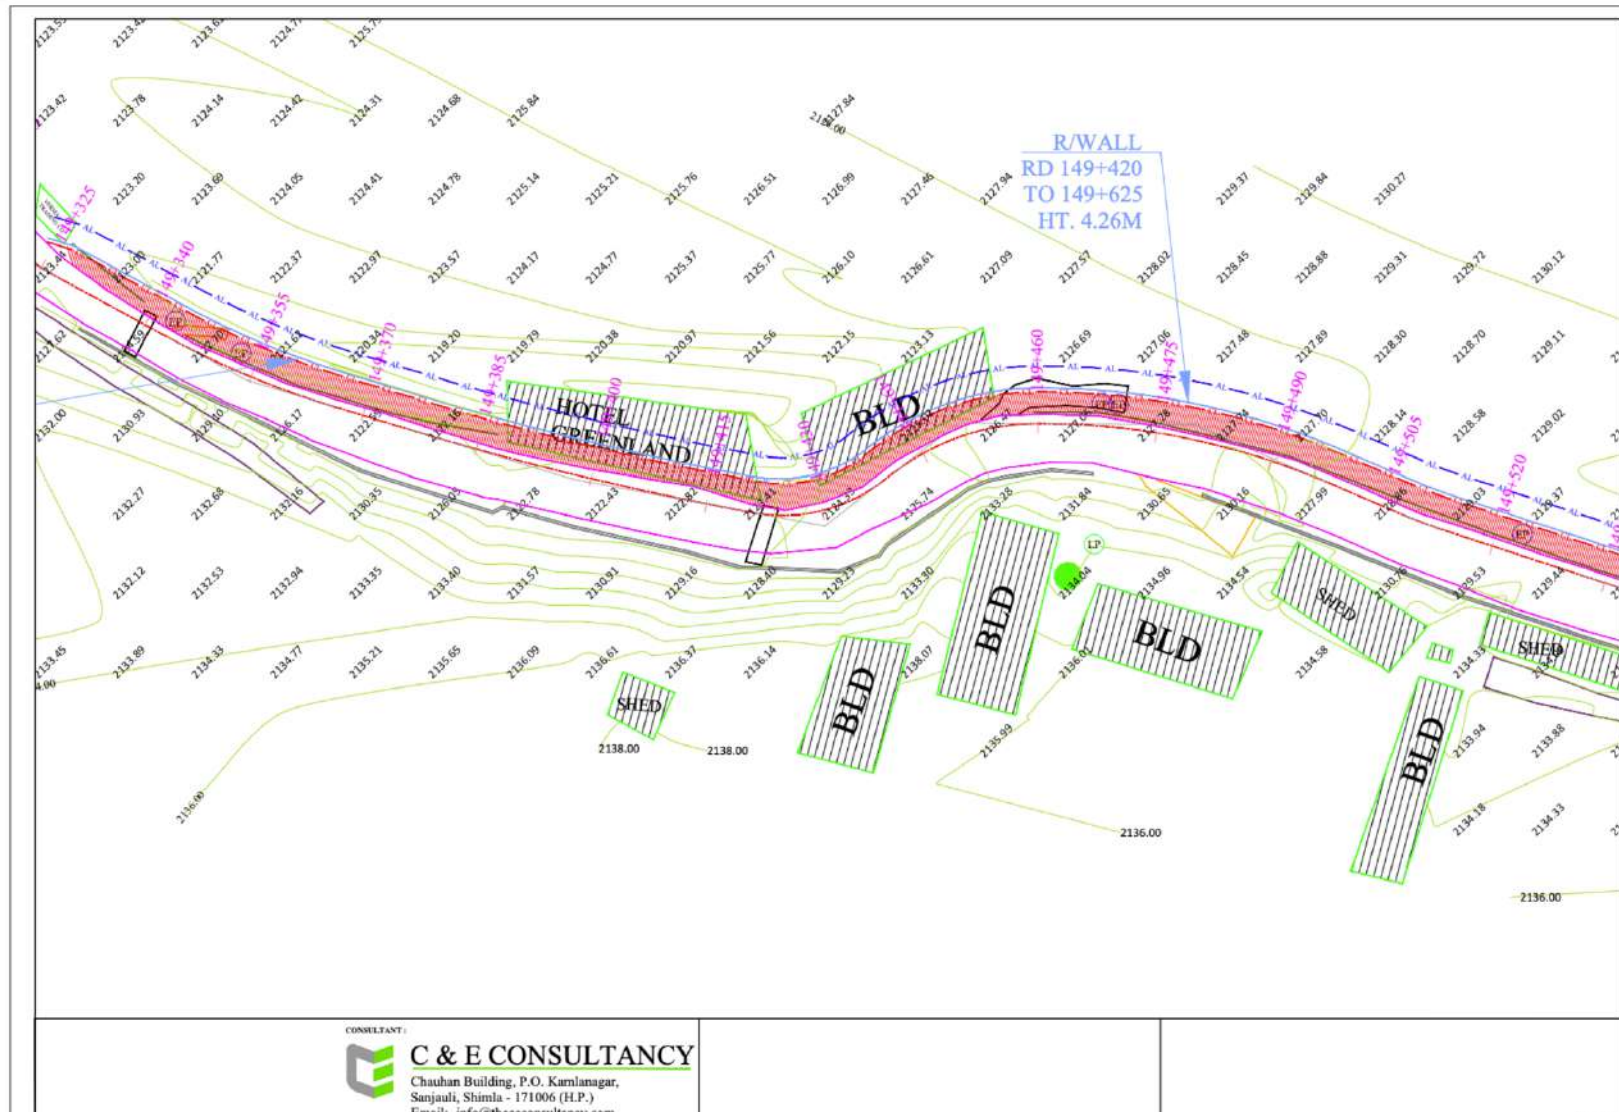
Proposed Road Design for the Improvement of MDR-67 Road Section (Victory Tunnel to Auckland Tunnel) - 8
